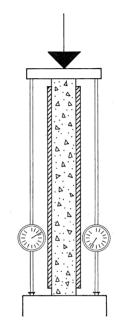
Compression test on plastered concrete slab according to Ryder (1957).
